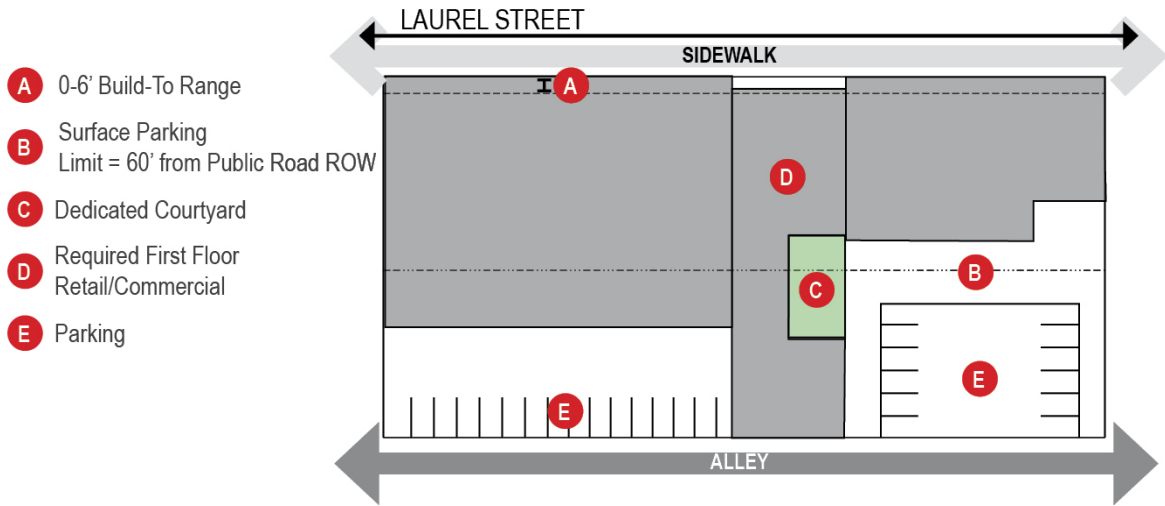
MS Example of Shopfront and Common Entry Building Types
